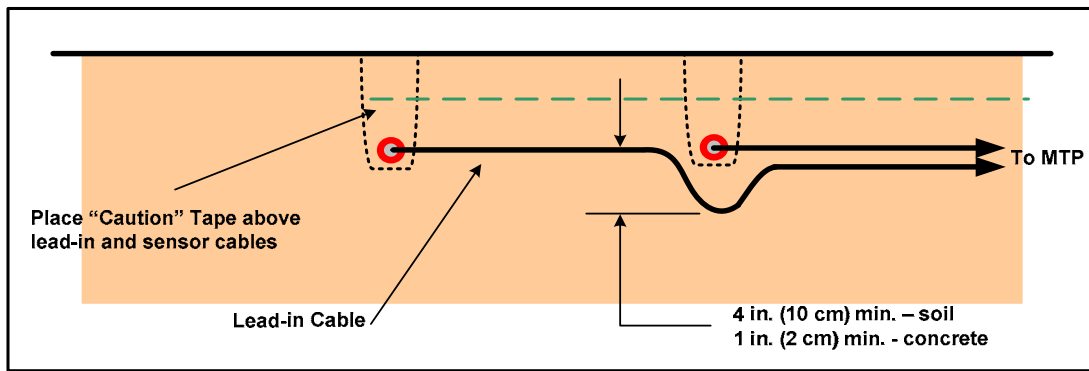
Lead-in Cable Crossing under Sensor Cable at Start-up
